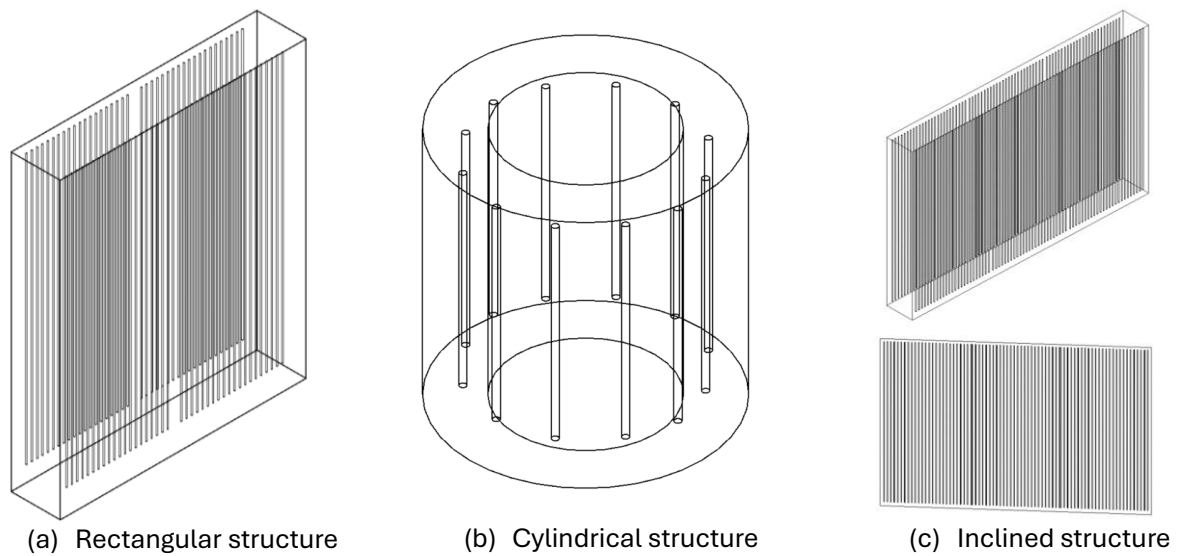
Structural element models with main rebar modeled in the Rhinoceros model space
